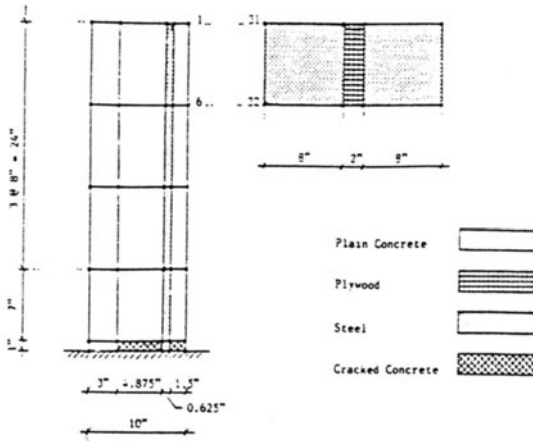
Impacting Mass and Reinforced Concrete Cantilever
